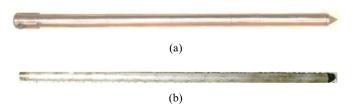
Different piles used in the FCV-AUT: (a) closed-ended steel pile; (b) open-ended steel pile
